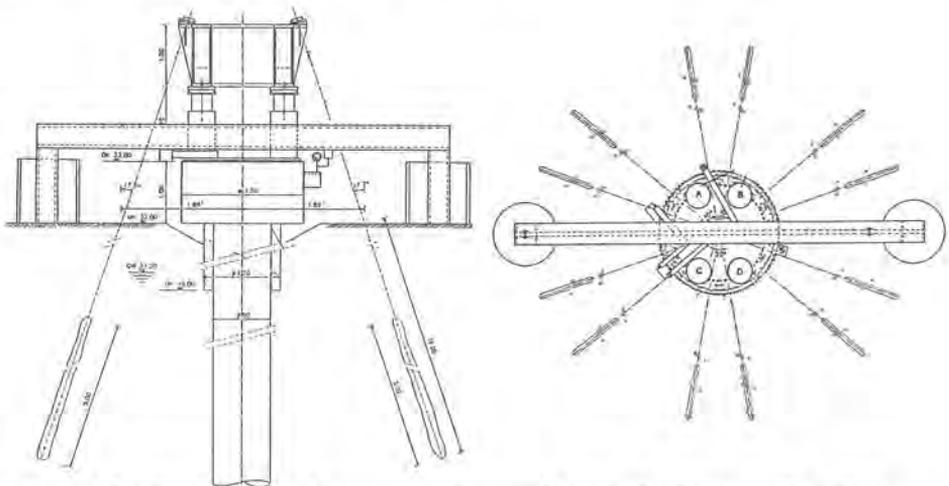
Loading facilities and measurement systems of the test pile · Potsdamer Platz · Berlin.
